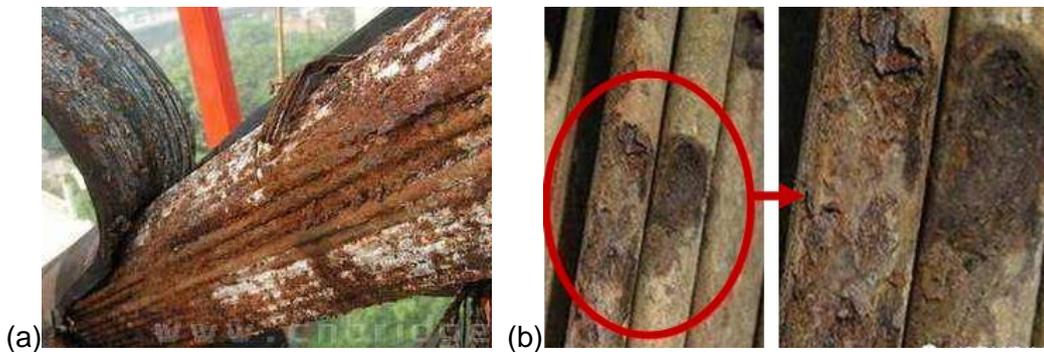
Corrosive types of steel wire: (a) uniform corrosion (b) pitting corrosion
